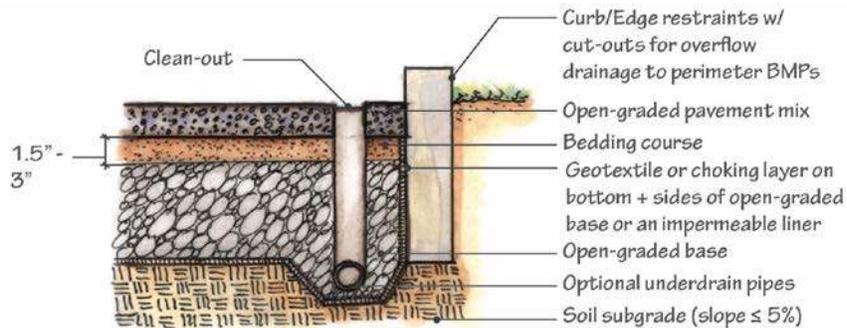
J: Illustration of Permeable Pavement with an Underdrain
